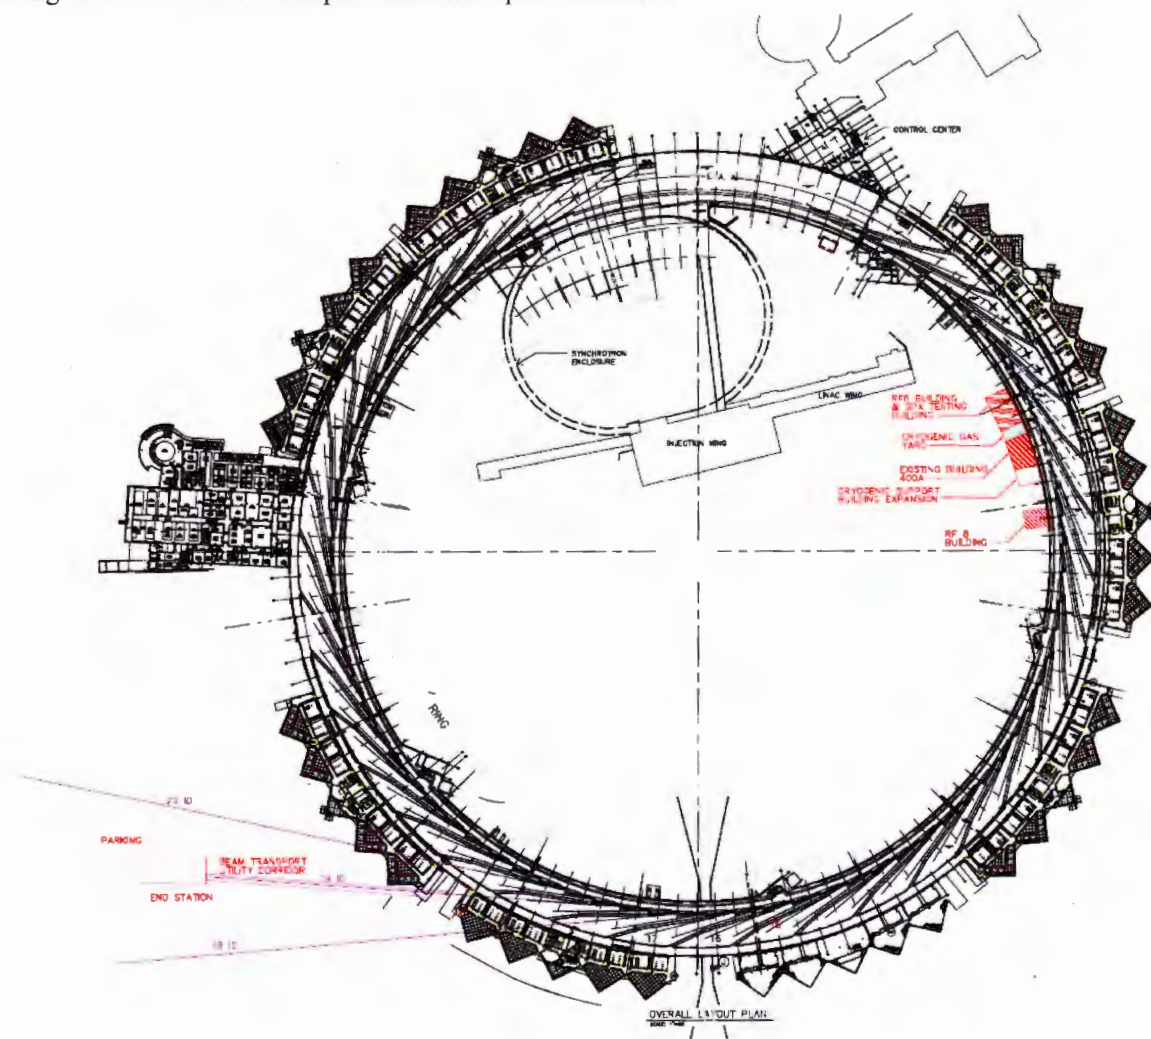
Proposed APS site plan with the SPX radio frequency building (blue) and the wide-field imaging beamline (red).
